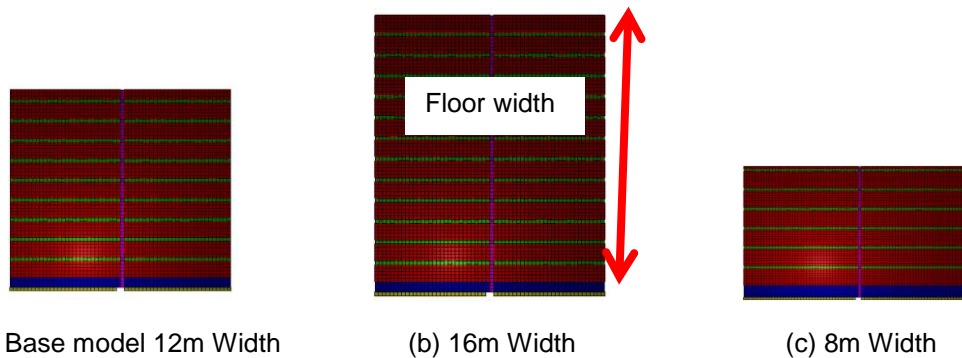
Floor width parameter variation indicative layouts for arrangement 2
